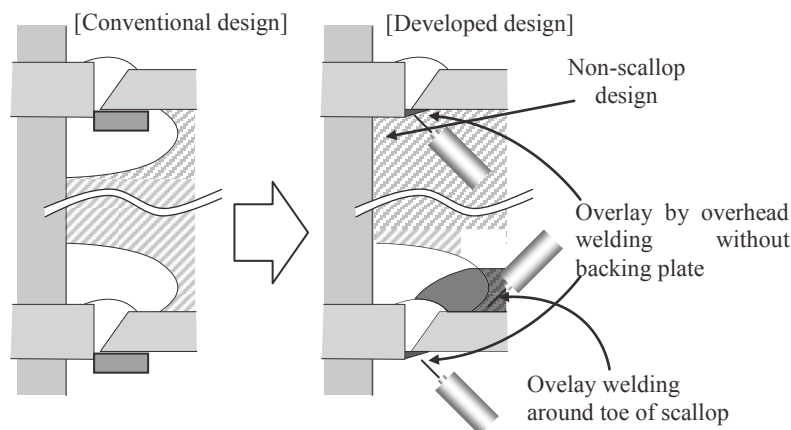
Conclusion: The design and welding process suitable for on-site joint (Ref.Fig.5.16)
